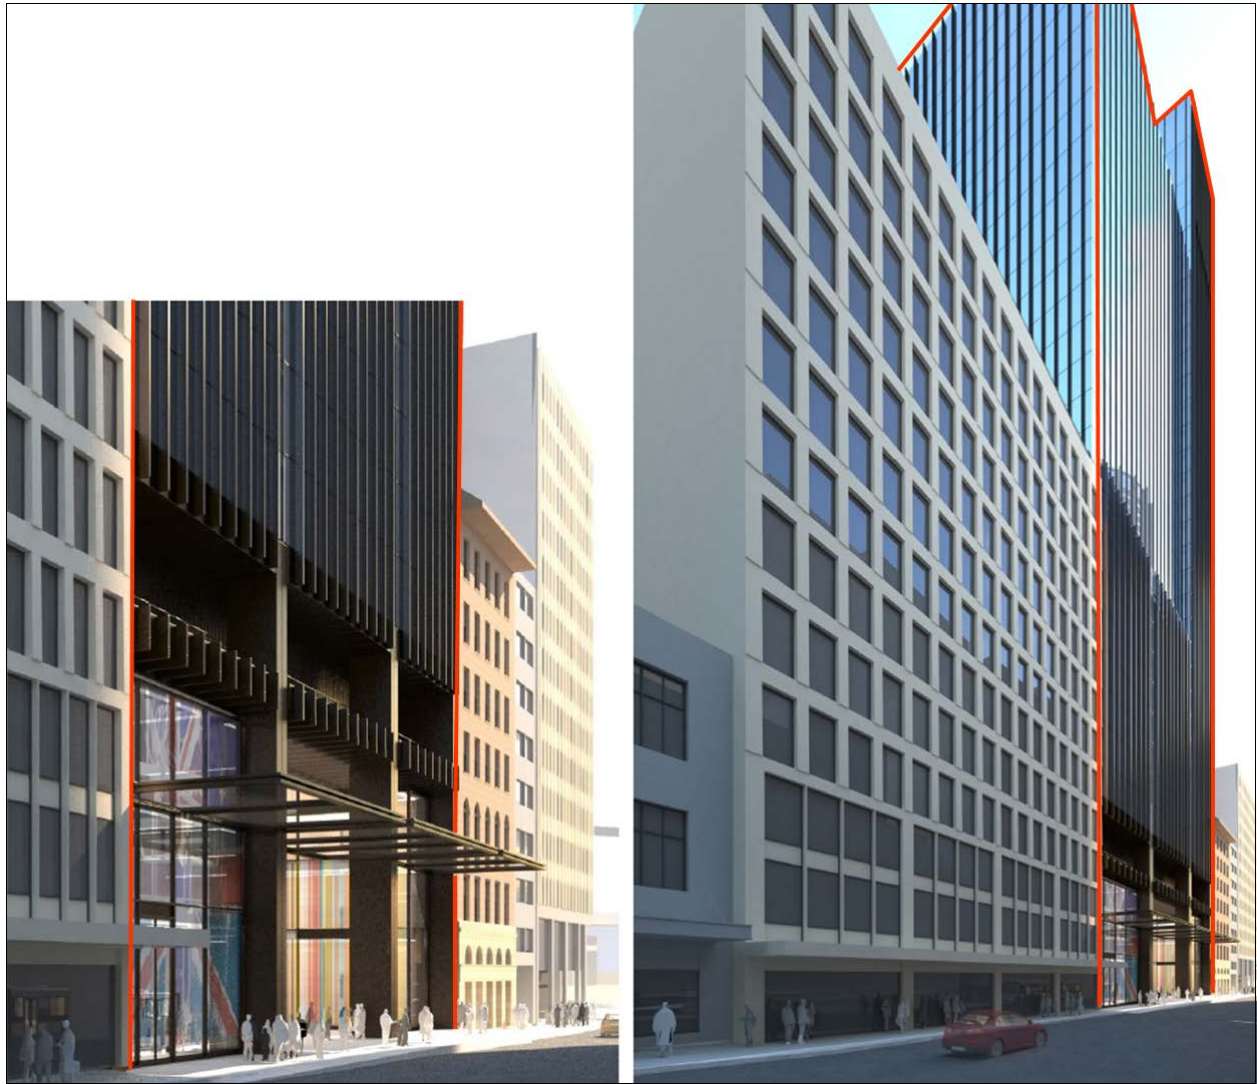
Detail of podium and main entrance (left) and view north along George Street towards the George Street elevation (right) (Source: Applicant's EIS)
